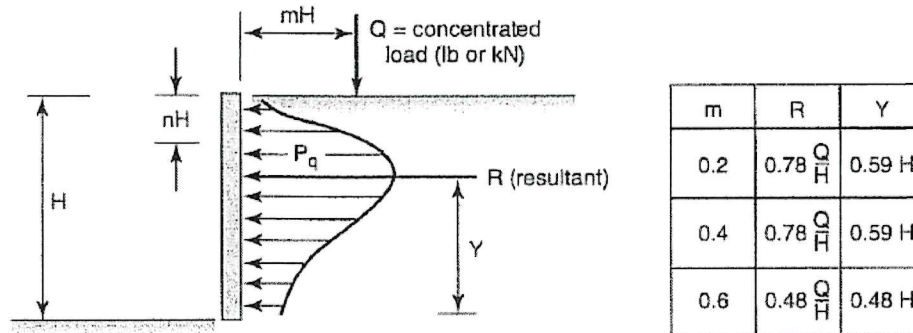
Pressure distribution against vertical wall resulting from point load, Q .
